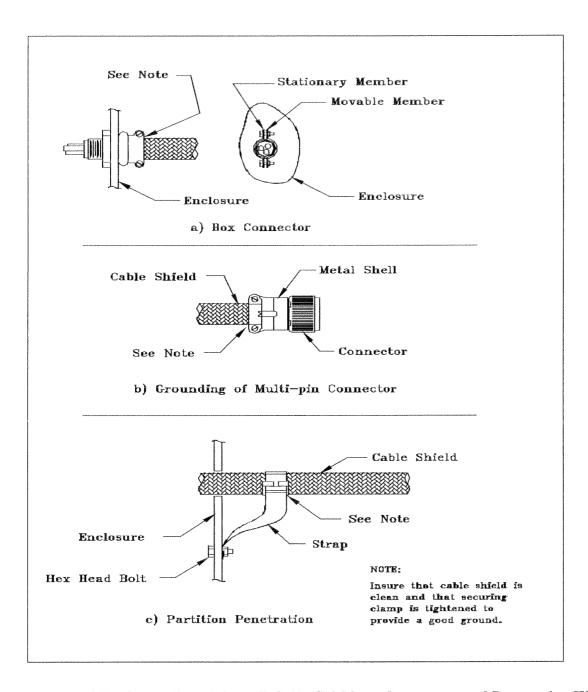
Figure III. Grounding of Overall Cable Shields to Connectors and Penetrating Walls
